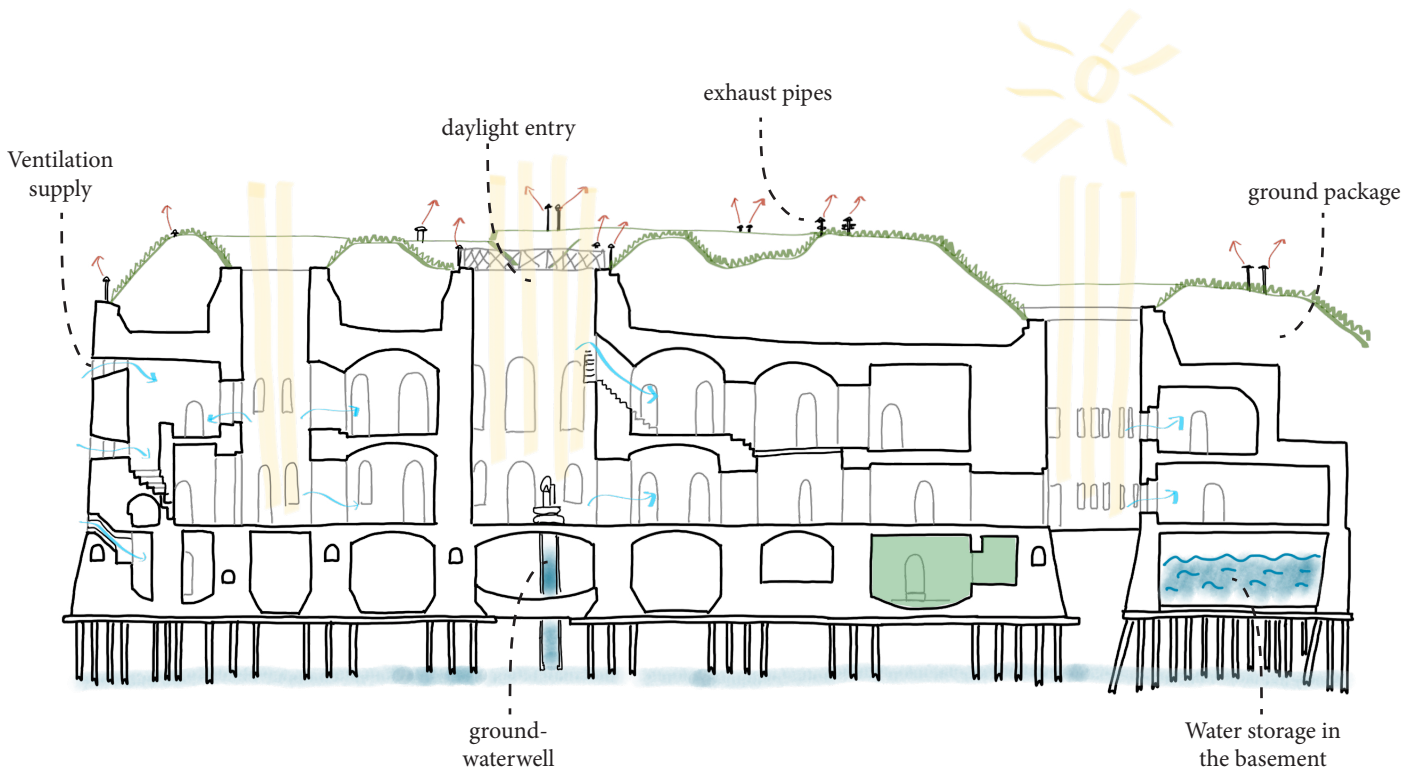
Section A & B, Towerfort Honswijk (own illustration)
